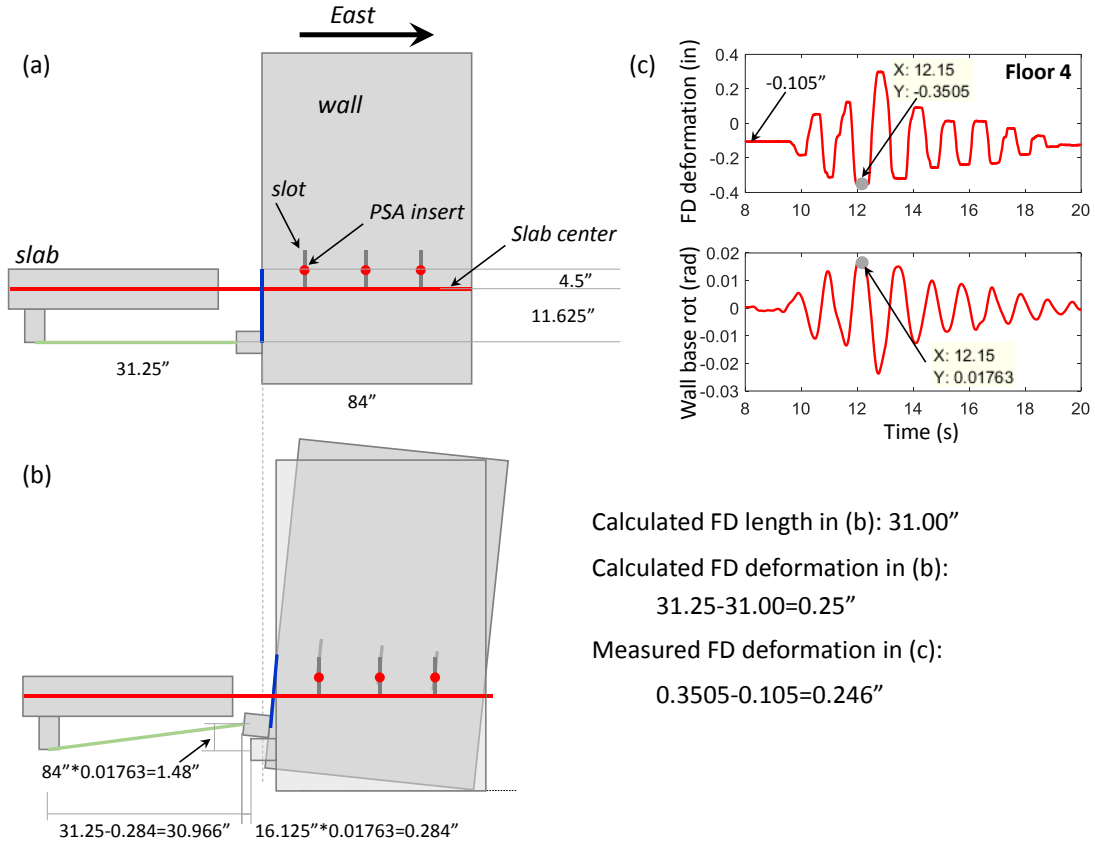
FD deformation in Test 17: schematic drawing: (a) before the specimen deformed; (b) after the specimen deformed; (c) FD axial deformation and wall base rotation.
